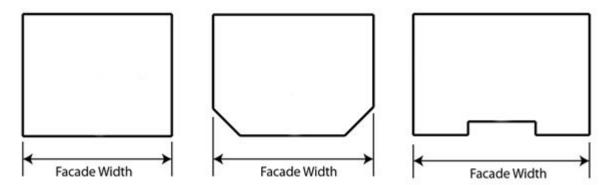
E: Illustration of façade width measurement on varied façade shapes.
